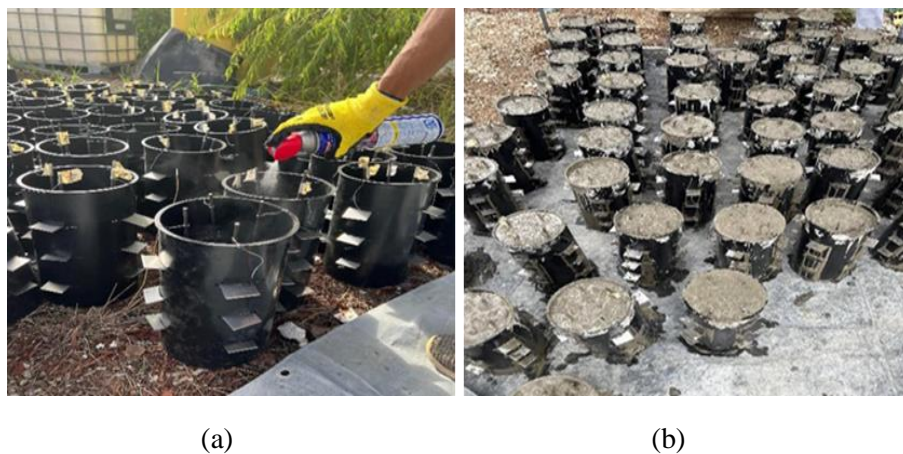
(a) Using WD-40, and (b) Casting Cylinders
